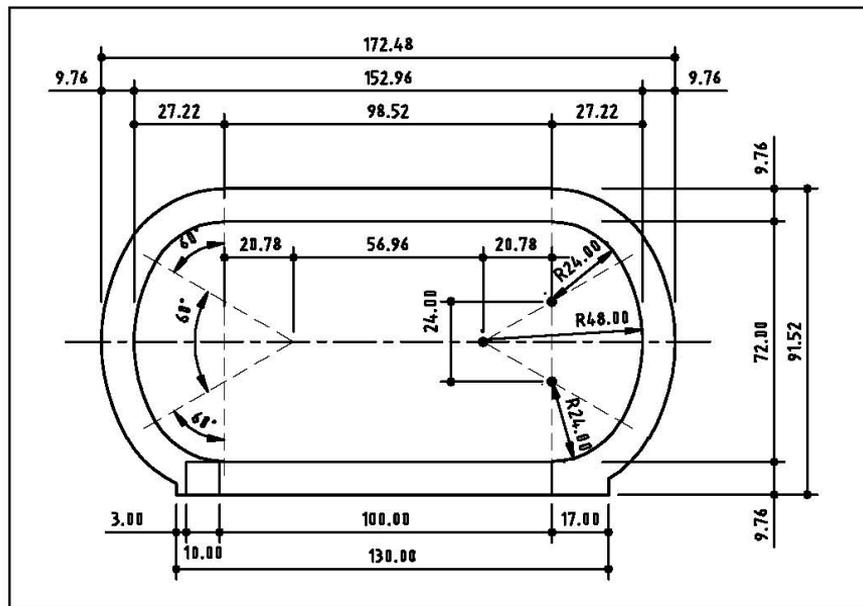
Shape and dimensions of 400m Double Bend Track (RadII 48m and 24m)
